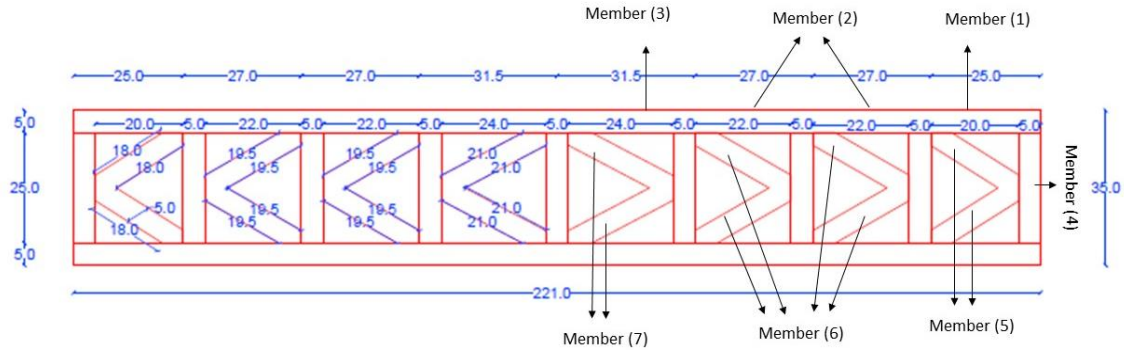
Detailed design of the proposed Truss using AutoCAD.
